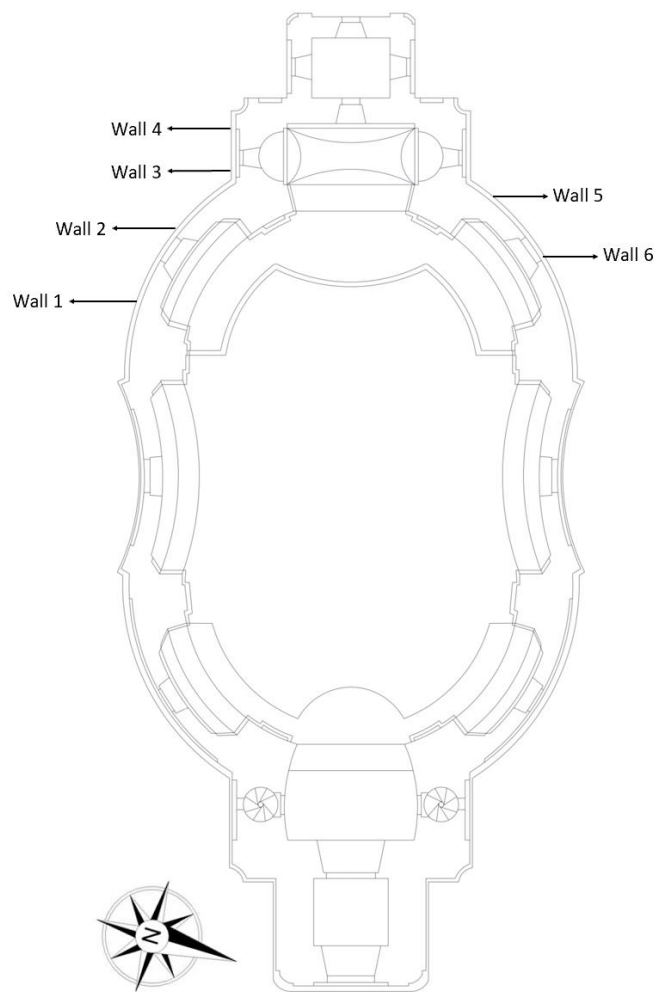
Locations of Masonry Wall Sections Sampled at St. Ann's Church.
